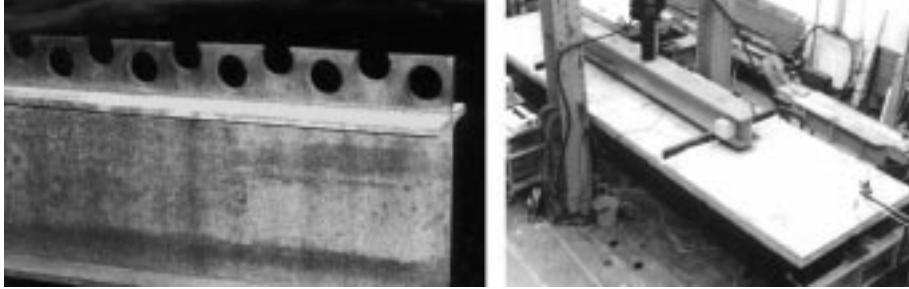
Girder with perforated shear connector (connector detail on the left, testing on the right)
